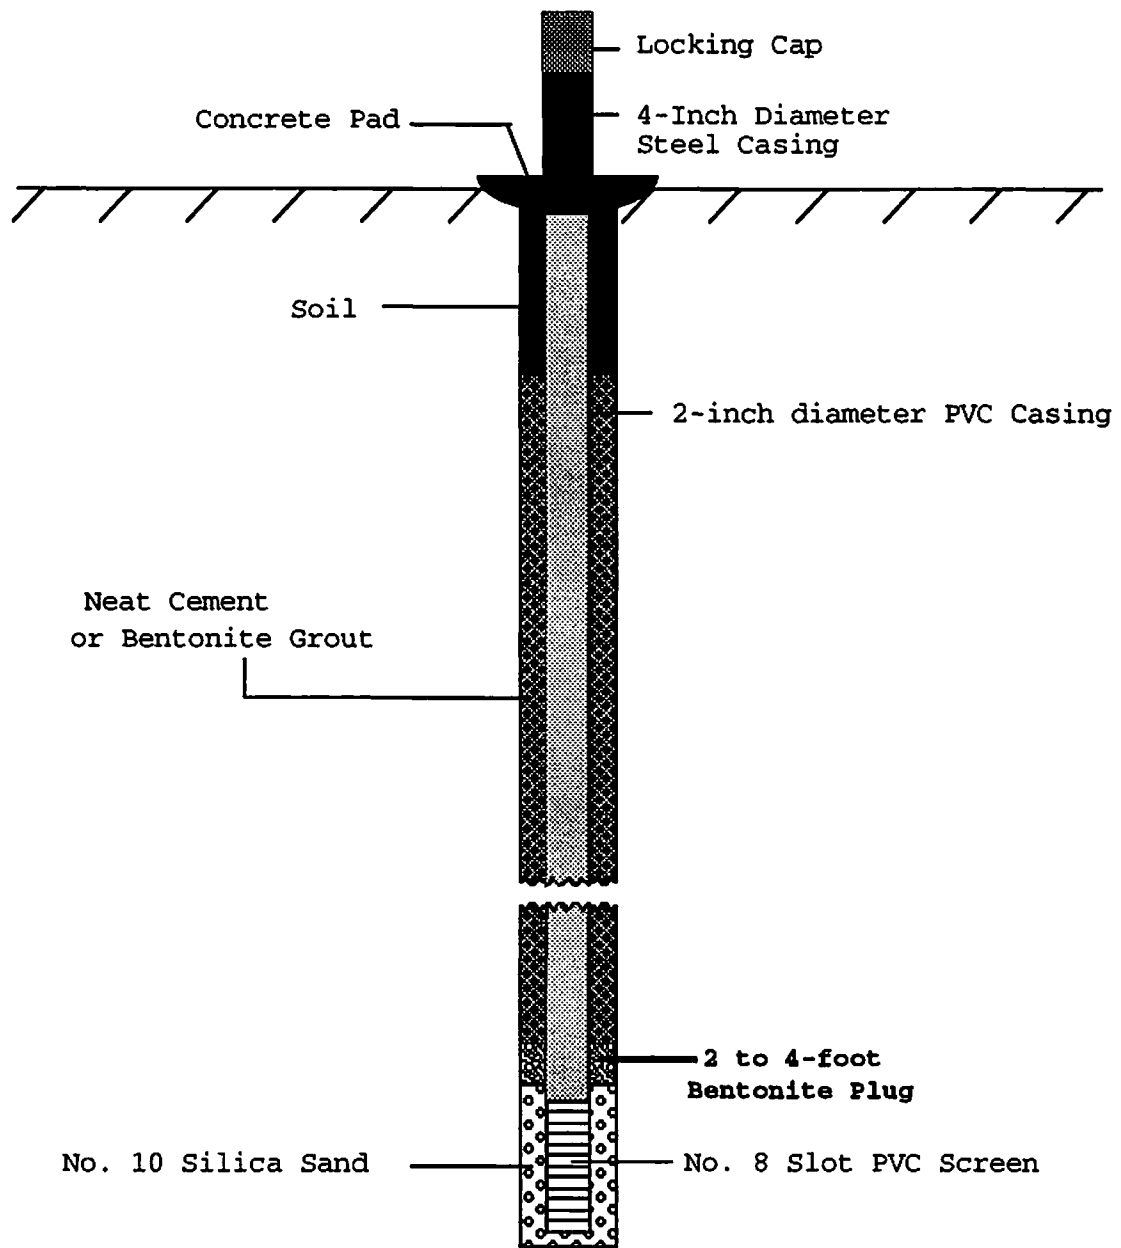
Construction design used for monitoring wells installed at the Grafton landfill.
